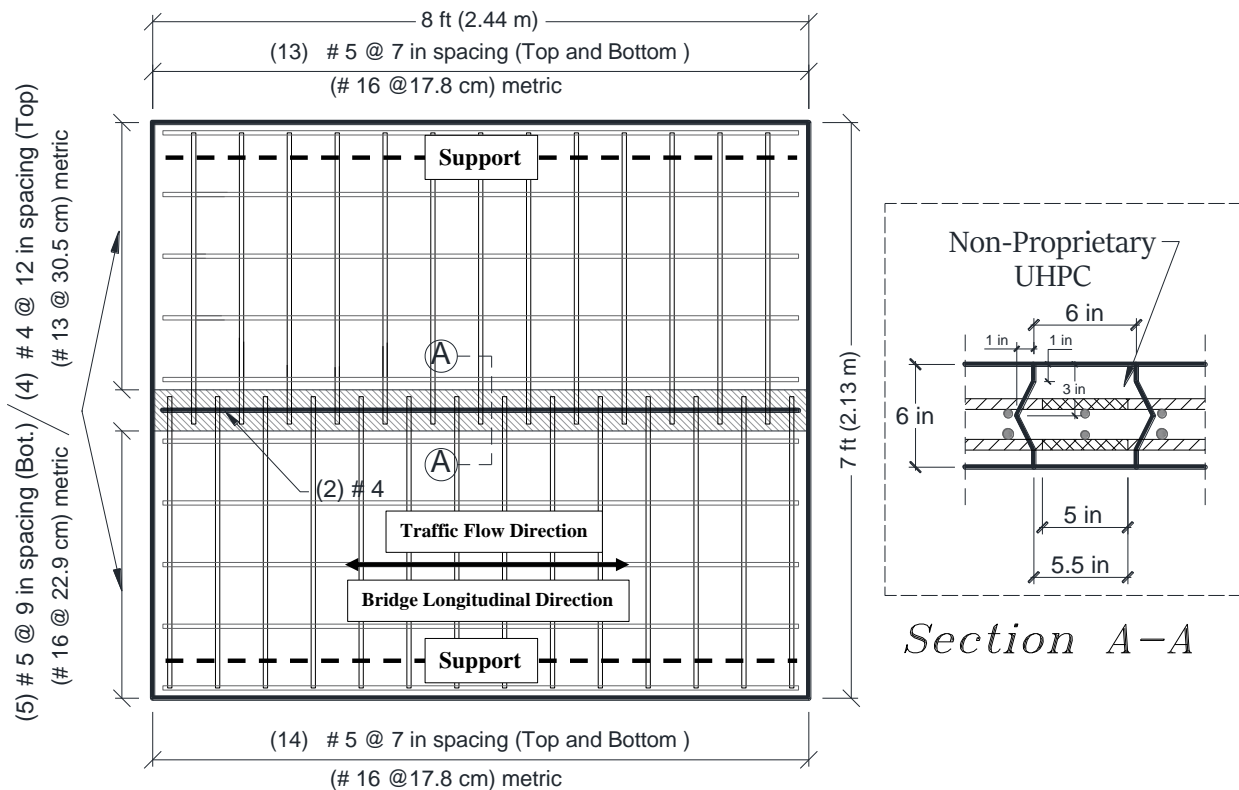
General Dimensions and structural details of the test specimens and a cross-sectional view of the longitudinal field joint (1 in = 2.54 cm, 1 ft = 30.48 cm).
